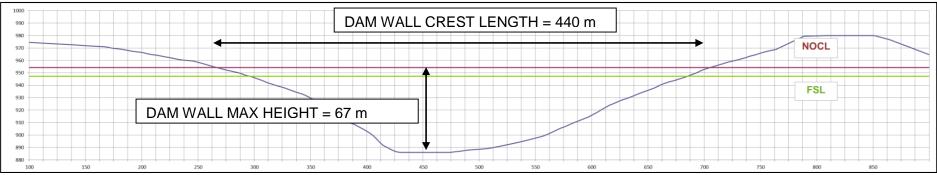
Cross-section of valley (looking downstream) at dam wall centreline
